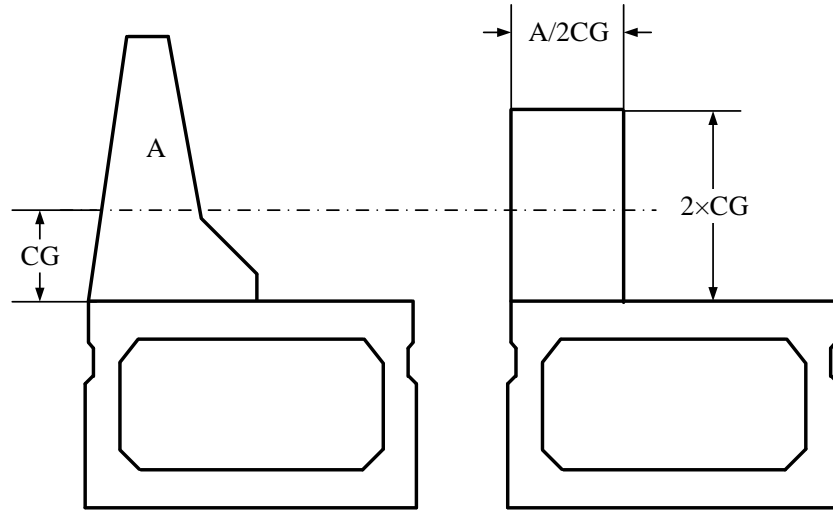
Equivalent area of barrier for calculating the section modulus for fascia girders.
